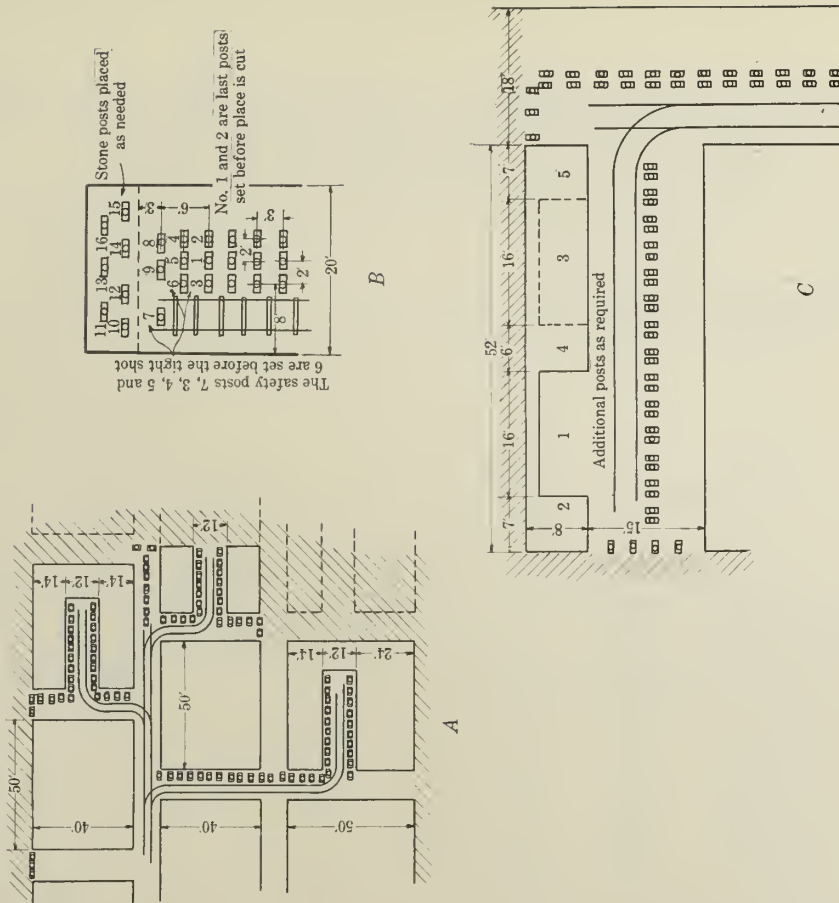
Details of pillar extraction and timbering mines, group B of type E: A, Plan showing sequence of removing entry chain pillars and barrier and entry stumps between caved areas; B, sketch showing position of timber upon completion of loading the coal in a room (numbers indicate order of placing timber); C, plan of room-pillar process of removal, with location of timber and breakline posts.
